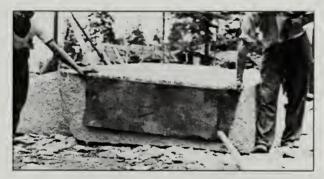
Stone masons at work on Sieur de Monts Bridge, 1940. (Federal Works Agency, Public Roads Administration, "Progress Views of Structure: Kebo Mountain Road Extension and Champlain Mountain Road (Ocean Drive) Project 6A3-8A10.")
